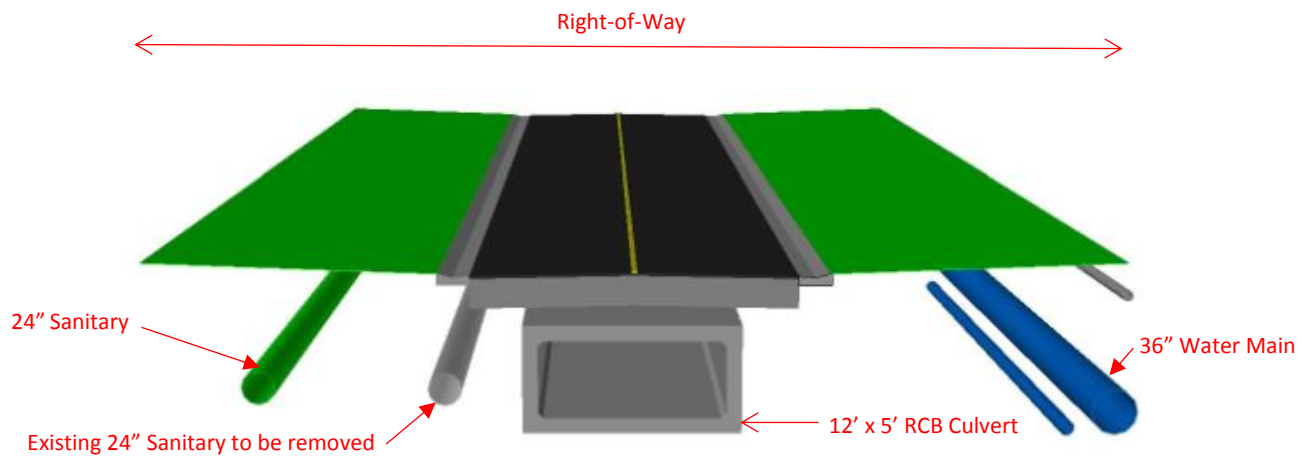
3D Rendering of Gray Street west of Howard Avenue Typical Section (NTS)
